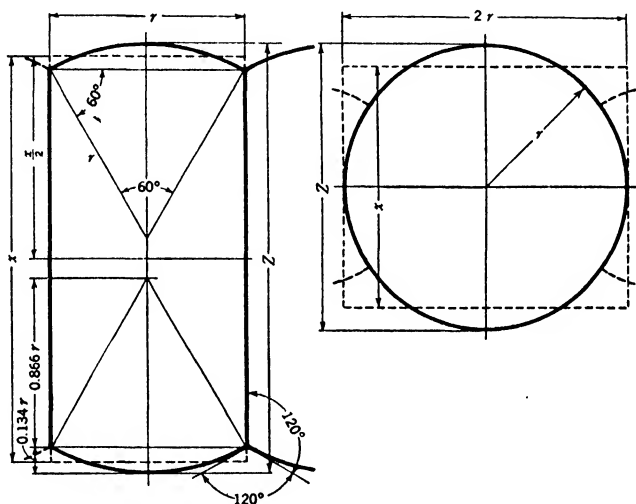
Plan of Diaphragm and Circular-type Cells. (Courtesy of Civil Engineering.)
